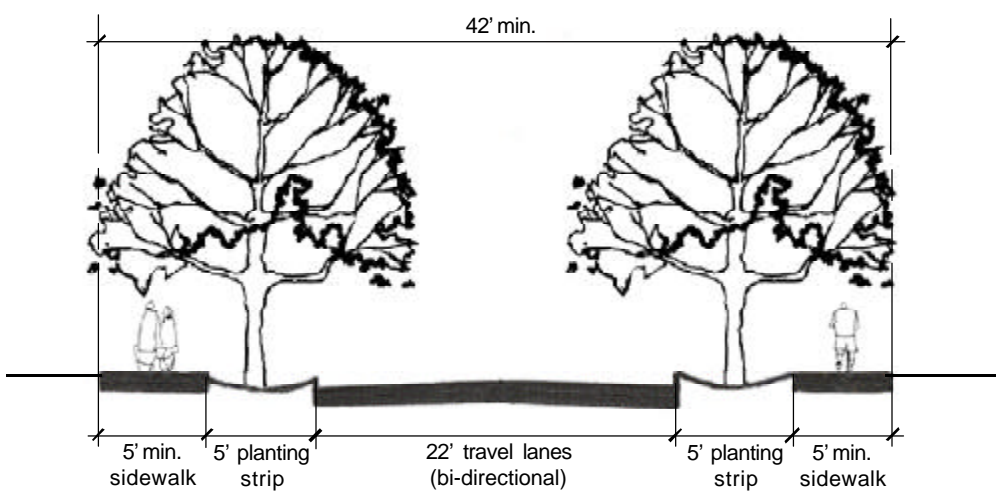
Road Section G -- Alarid Neighborhood Edge Road
